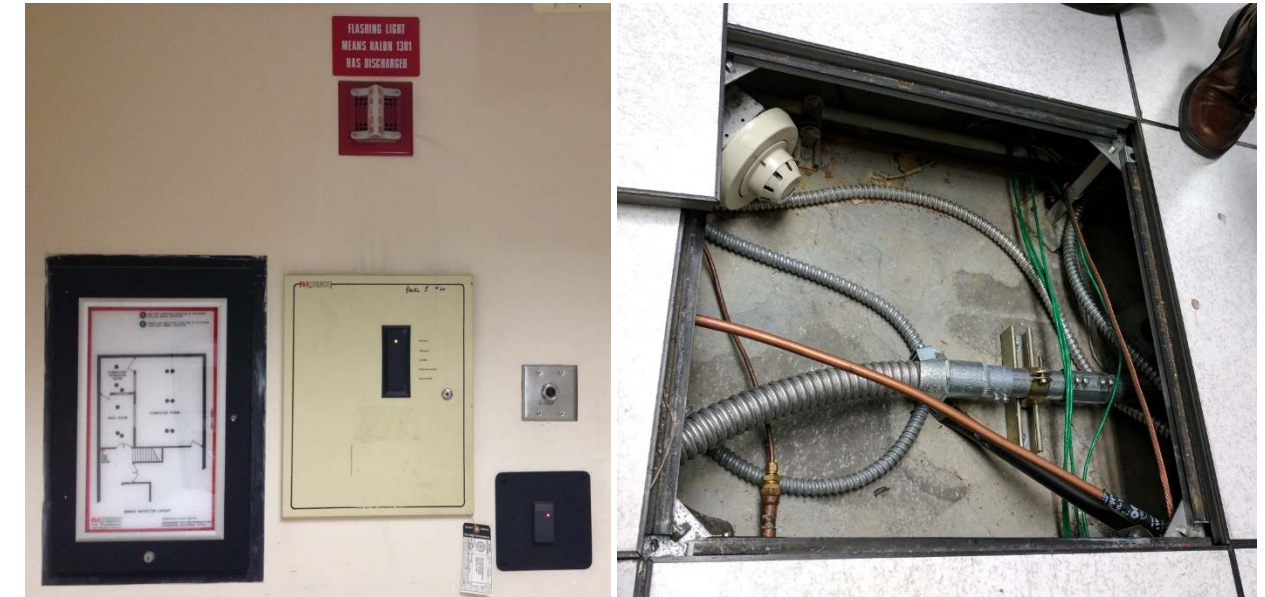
Computer Room Clean Agent Fire Suppression and Raised Floor
